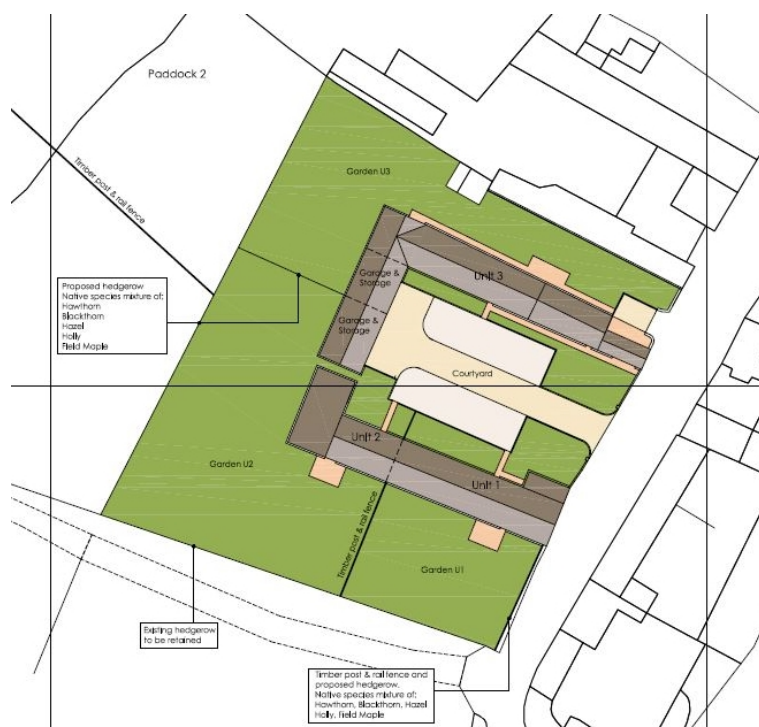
The layout of the courtyard appears fragmented; vehicle dominant and paths to building entrances do not correspond with architectural layouts.
